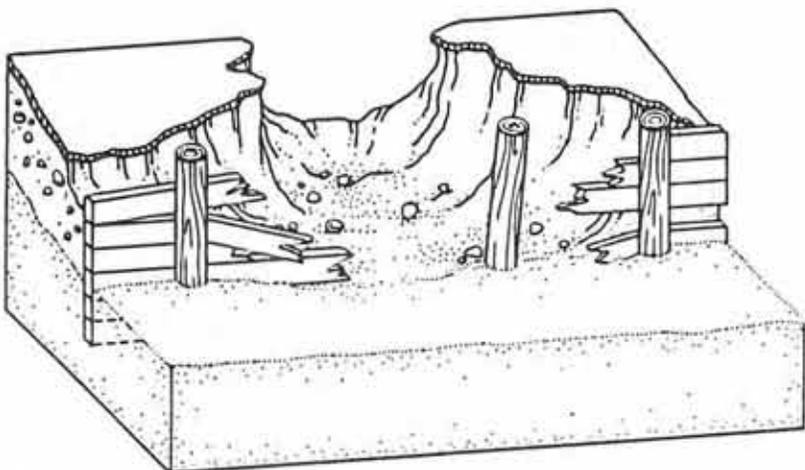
Progressive lateral failure of a wooden scawall/bulkhead.
